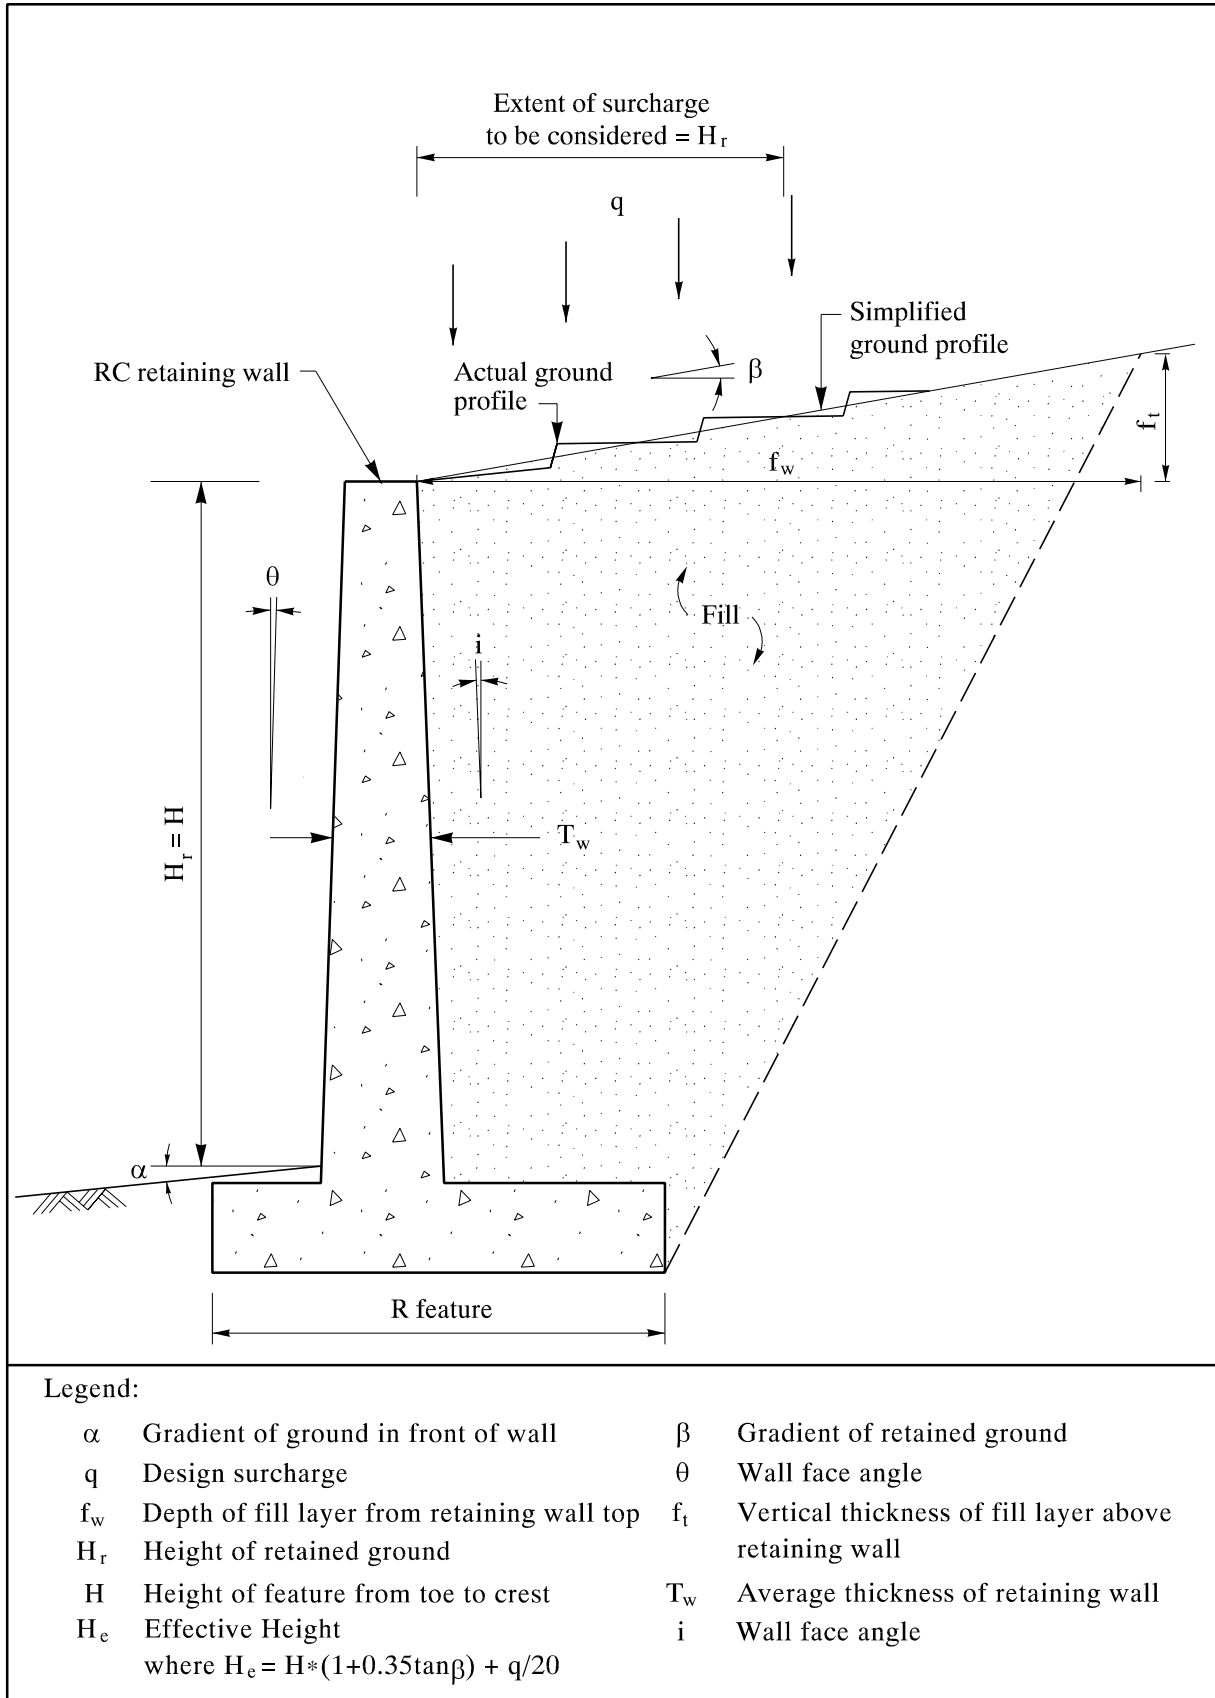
Simplified Geometry of R Feature with a RC Retaining Wall and the Adjacent Ground
